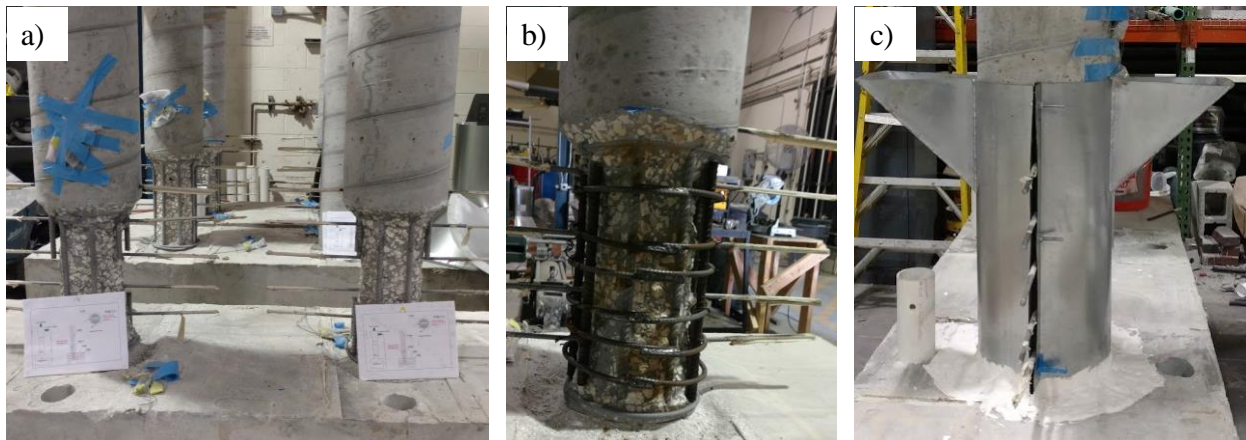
Repair Process: a) Sandblasting the Damaged Surface, b) Replacing Transverse Reinforcements, c) Forming the Column and Casting UHPC.
